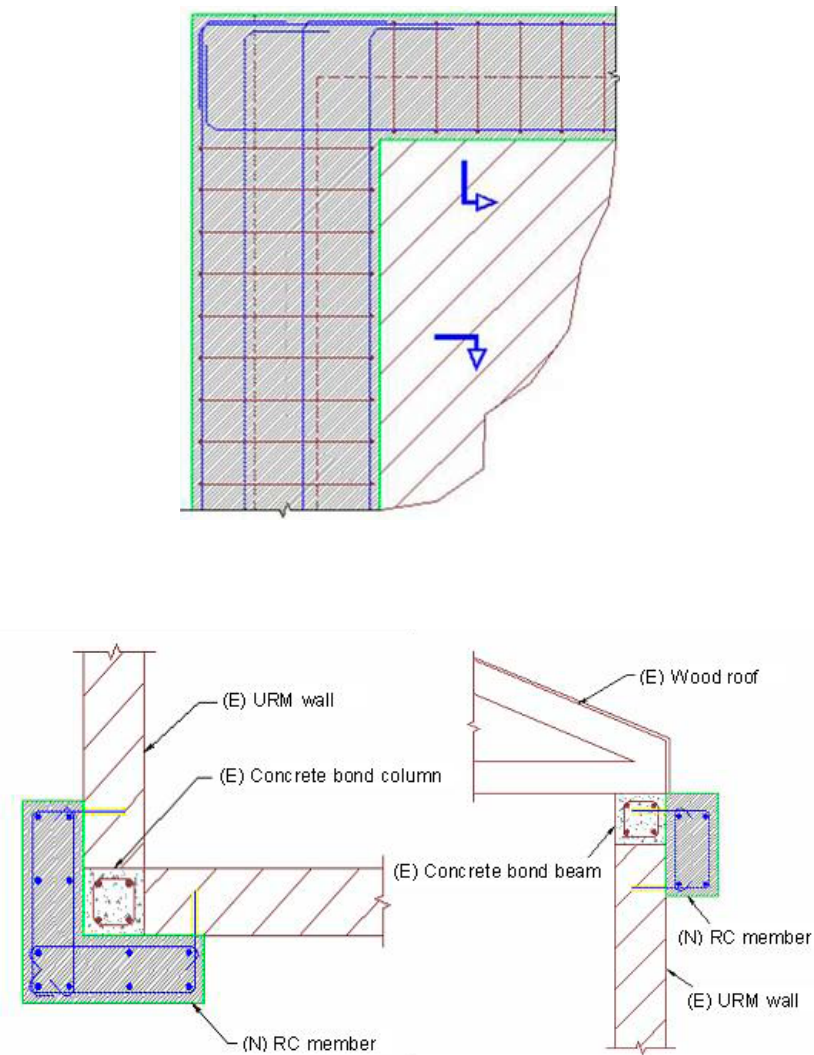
Proposed retrofit for the joints of concrete beam-column frames.
